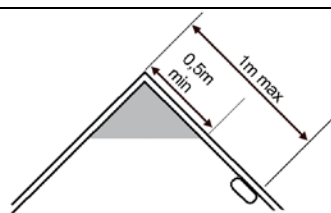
Recommended installation location for smoke alarms / heat detectors in rooms with sloped ceilings or gables (slope > 20°)
